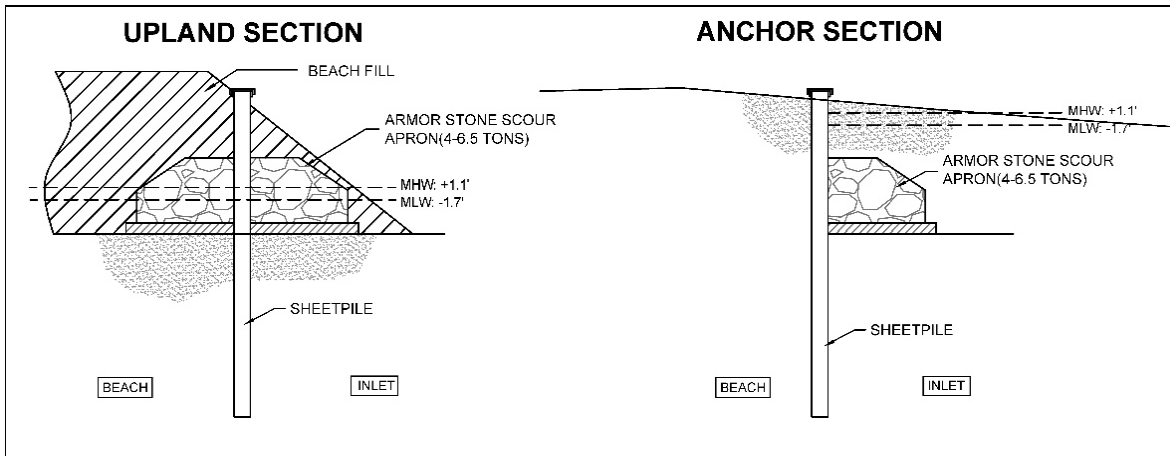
Terminal Groin Anchor and Upland Cross Sections
